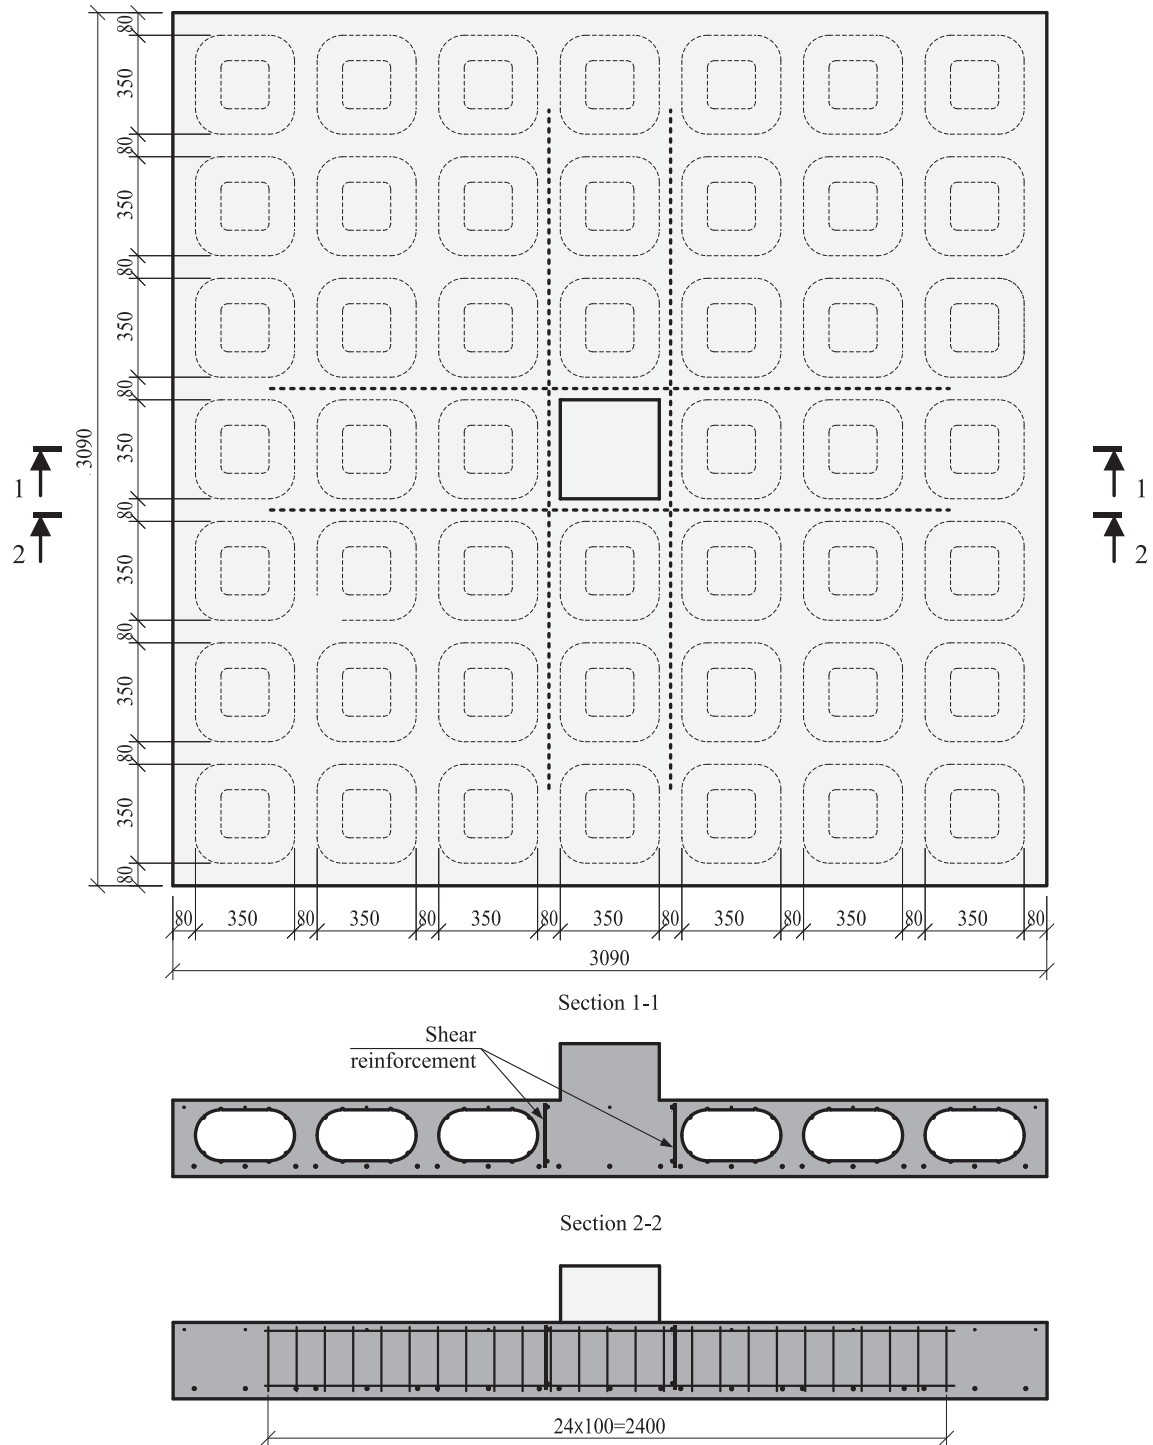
Geometry and reinforcement of the specimens BPR1-1 and BPR1-2: plan and section.
